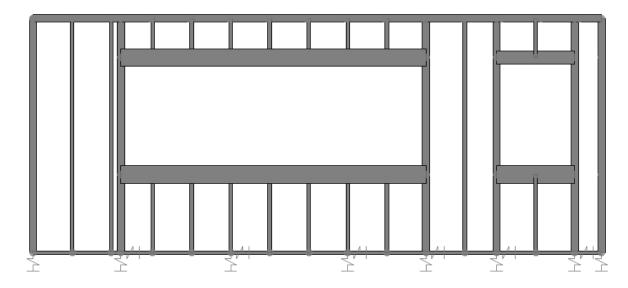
Example of wall. (First floor, eastern side of north wall. View from exterior.).
